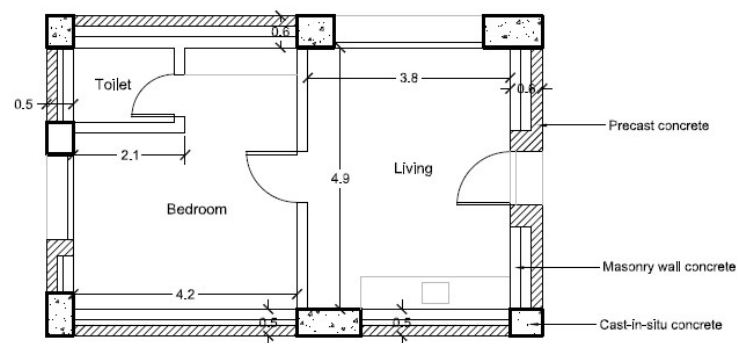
Prototype dwelling with a double-wall concrete as a building envelope<sup>2</sup>
